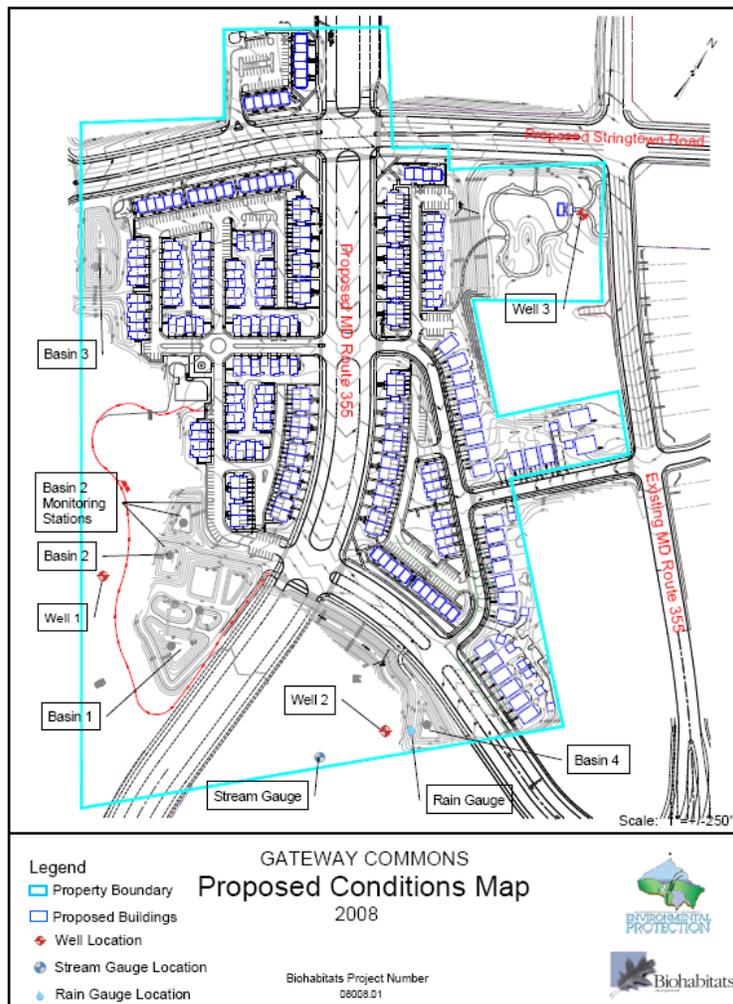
Gateway Commons site plan (proposed) and monitoring locations (Thompson 2009).
